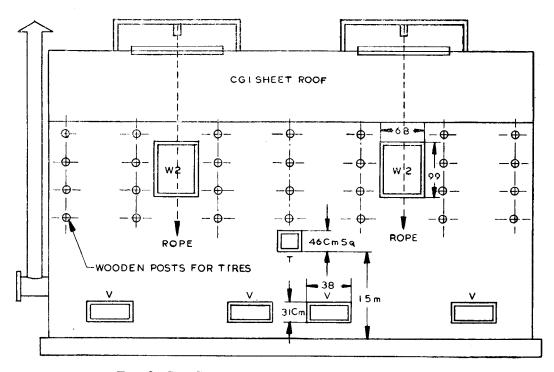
Side Elevation on CD Side (Andhra Barn)
